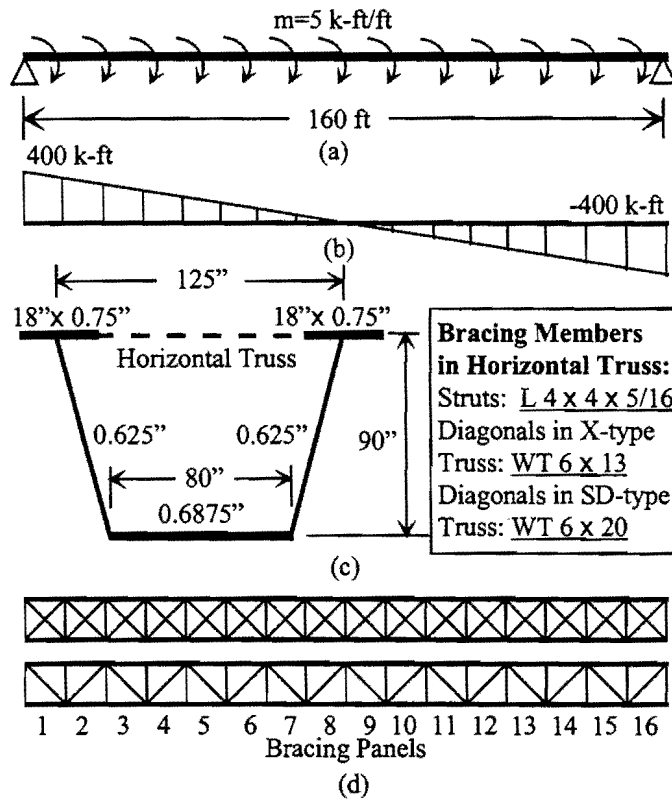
Pure Torsion on Simply Supported Straight Box Girder
